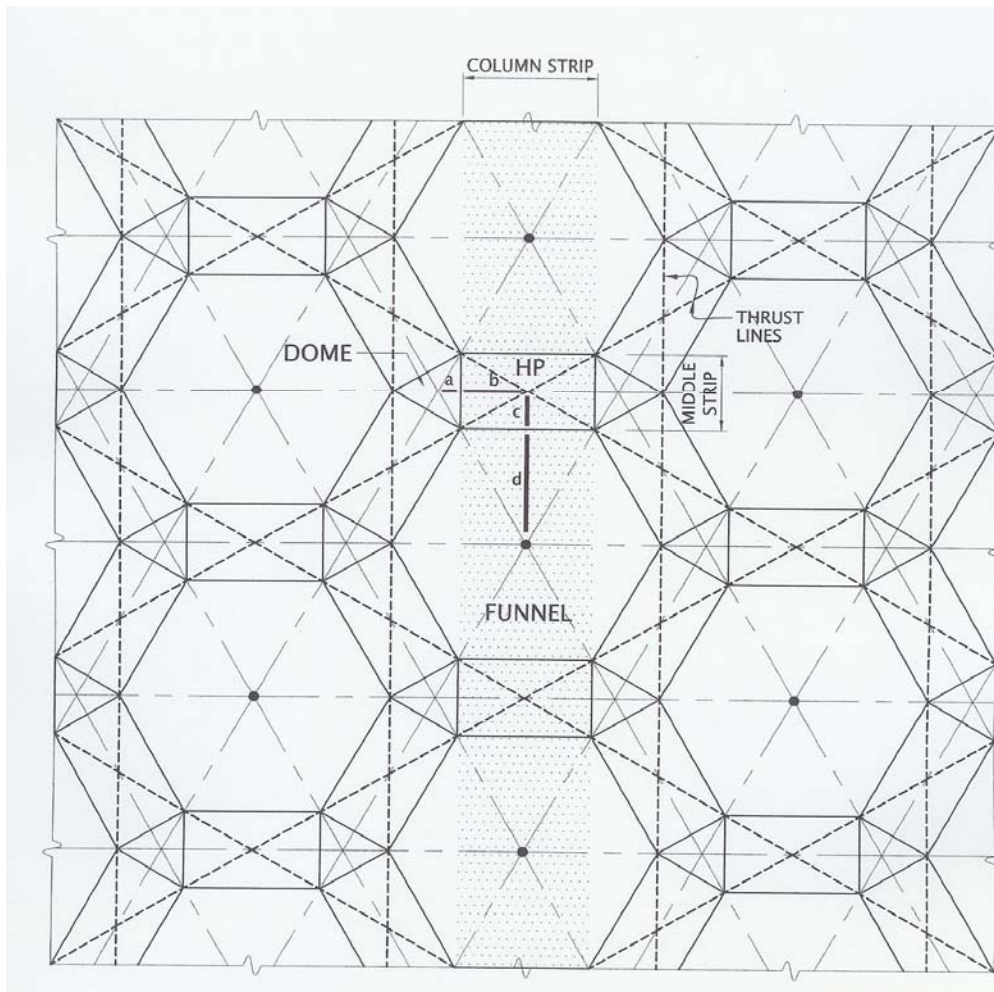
Structural membrane configuration generated for an equilateral-triangular column plan.
